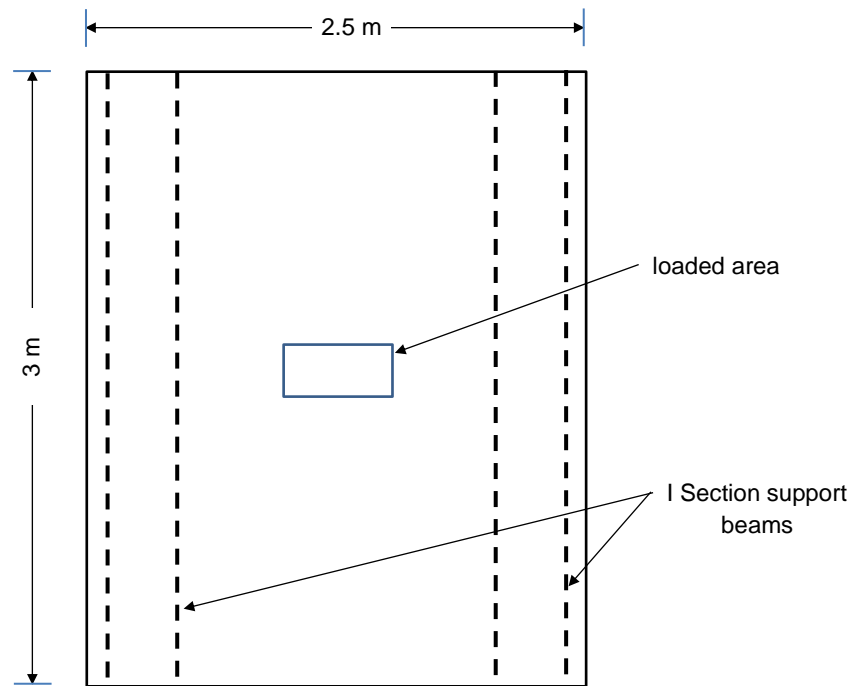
Typical dimension and loaded area bridge deck slab (El-Gamal et al. 2005)
